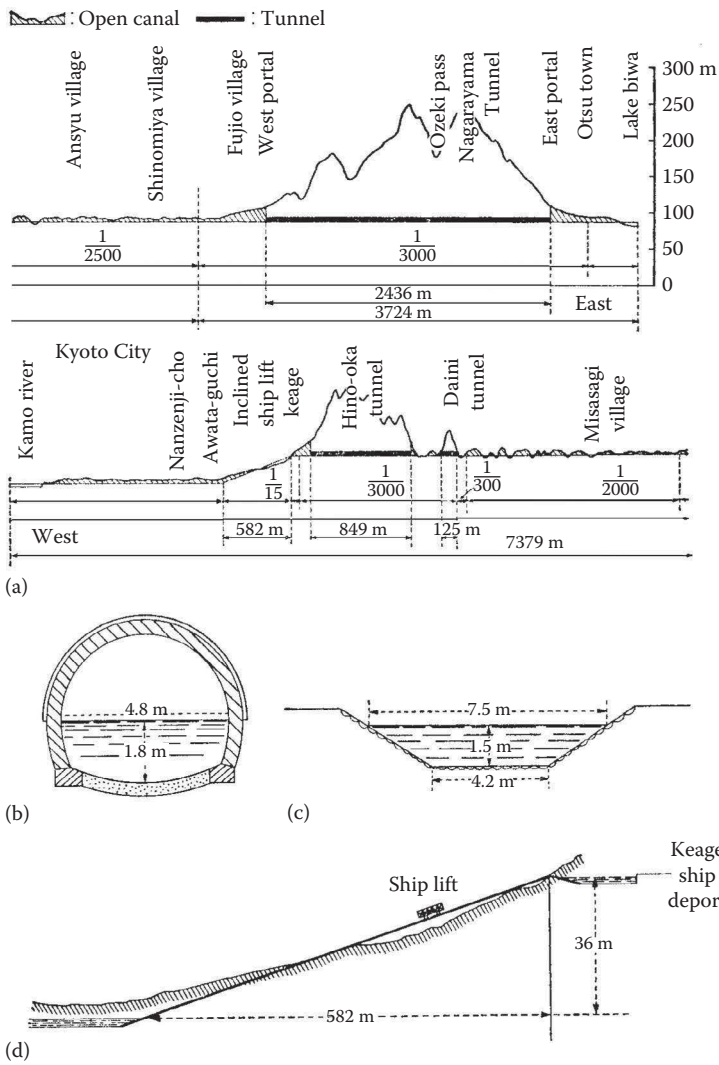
Biwako Canal: (a) profile, (b) cross section of the tunnel, (c) cross section of the open canal, and (d) the inclined ship lift. (From Kyoto City, *Construction of Biwako Canal and Electrification*, Bureau of Electric Supply, Ch. 5, pp. 177–349, 1939; Kyoto City, *Biwako Canal Project, History of Kyoto*, vol. 8, pp. 146–165, 1975. With Permission.)
